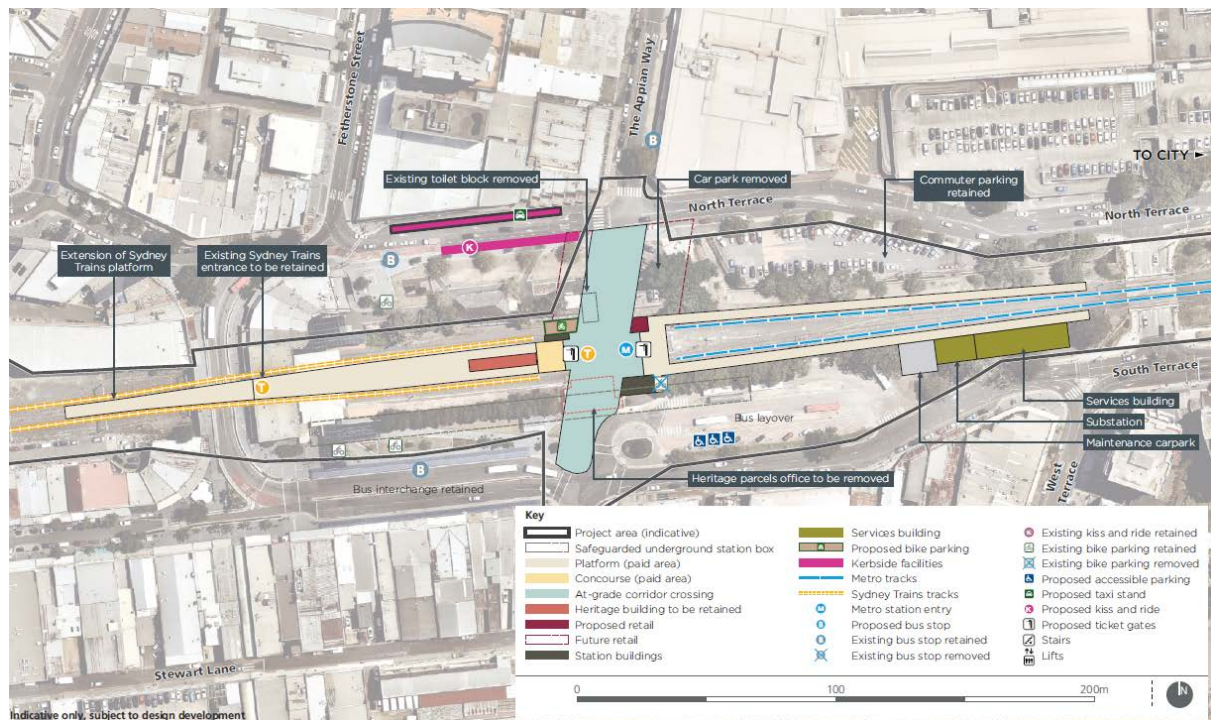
| Proposed modified layout of Bankstown Station (Source: Proponent's Modification Report)
